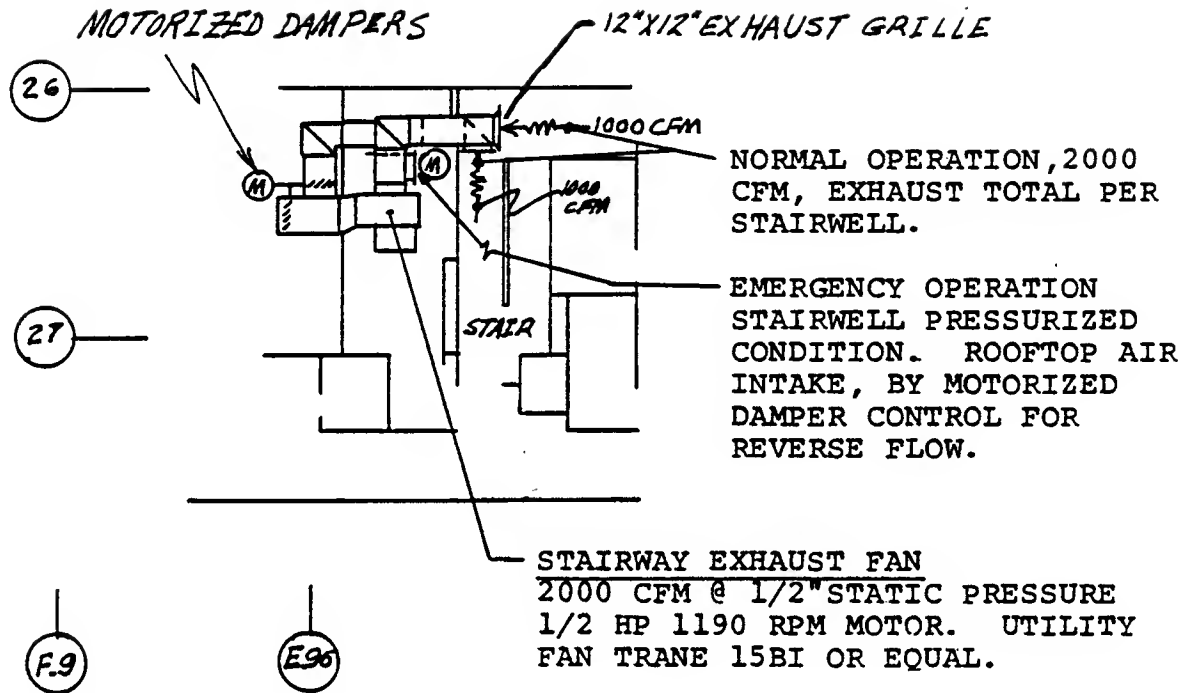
TYPICAL STAIRWELL EXHAUST SYSTEM
